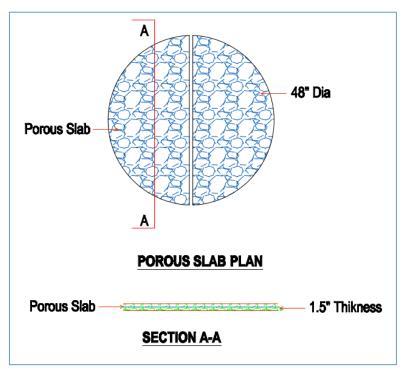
Plan and section of porous slab on which the digester of Biofil toilet is set
